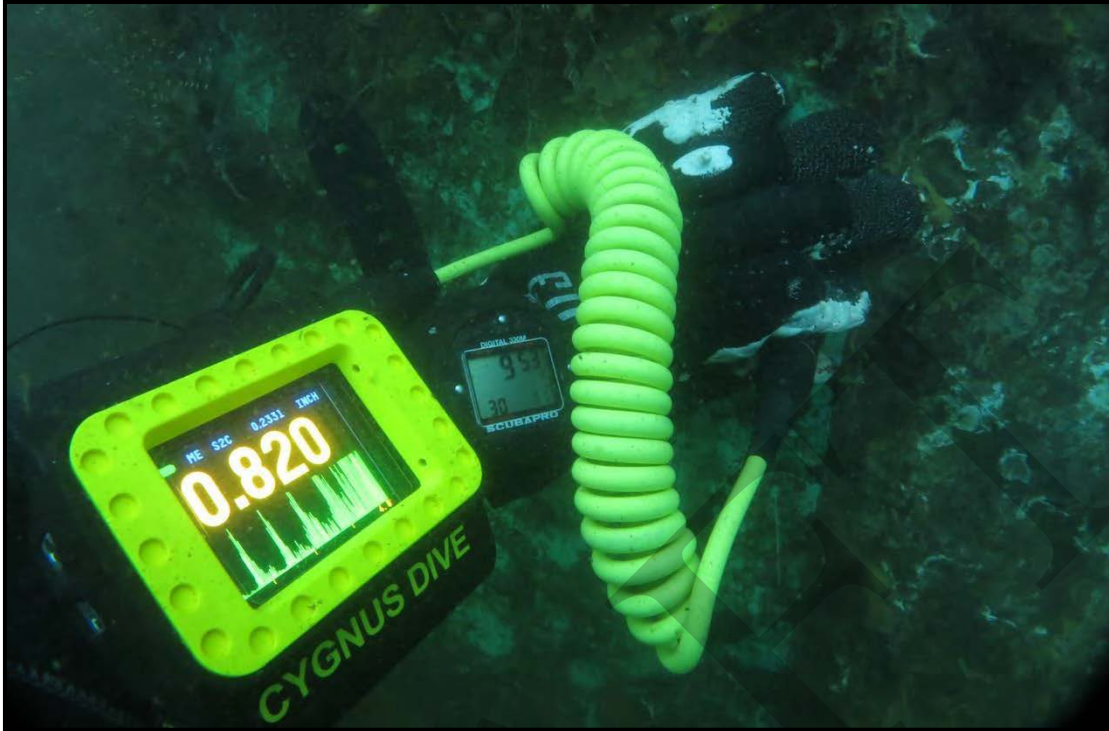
Ultrasonic thickness measurement at steel king pile on Pier 1.
